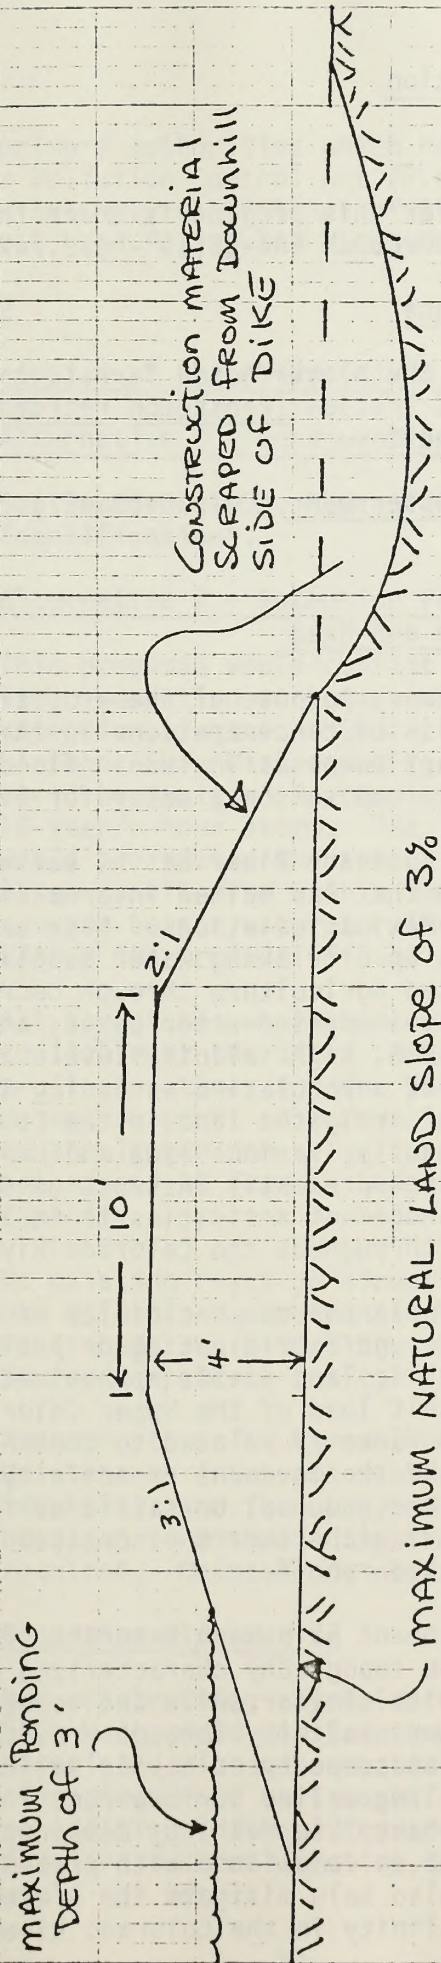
TYPICAL CROSS-SECTION OF PONDING DIKE
